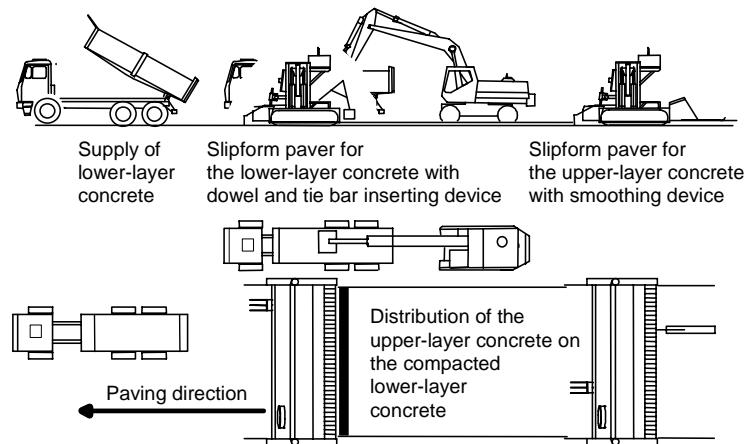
Slipform paving train consisting of two slipform pavers for construction of concrete pavements in two layers or two courses; here the concrete for the top course / layer is placed in front of the second paver by an excavator from the side
